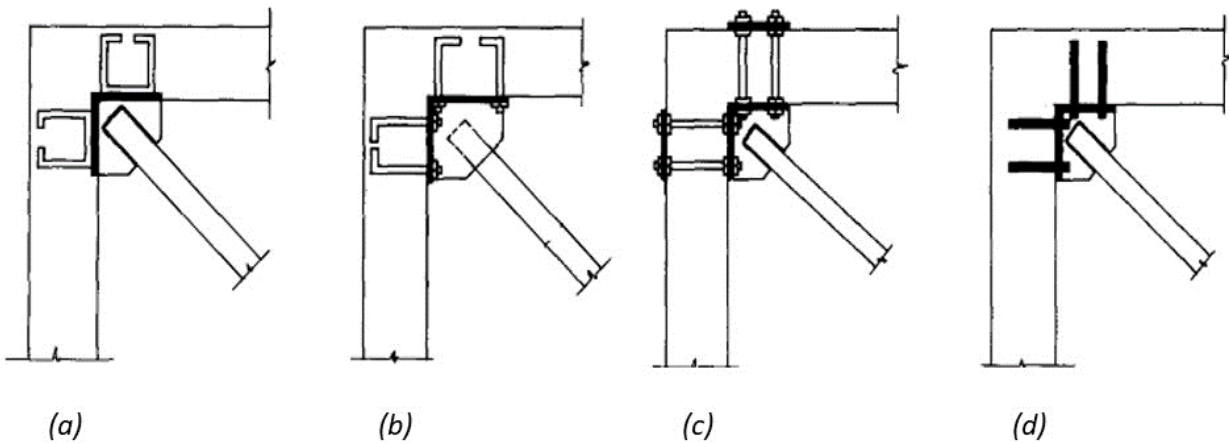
Brace-frame connection details (Maheri et al., 1997)
